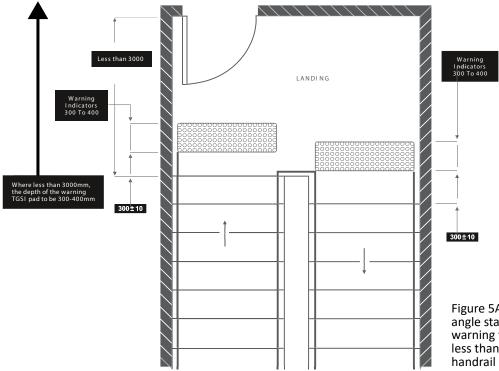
A (i): Warning indicators - right angle stairways and landings plan a of warning tactiles at a stairway landing less than 3000 with no continuous outer handrail
